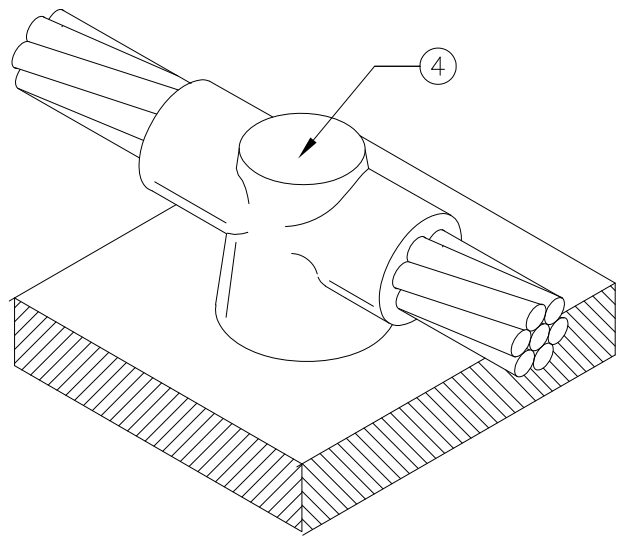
A – HORIZONTAL WIRE TAP TO A HORIZONTAL STEEL SURFACE. WIRE ON THE SURFACE.
